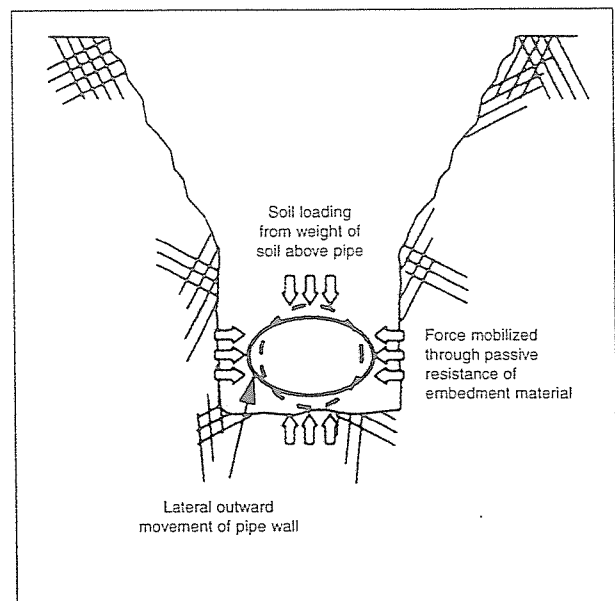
Mobilization of Enveloping Soil through Pipe Deformation
